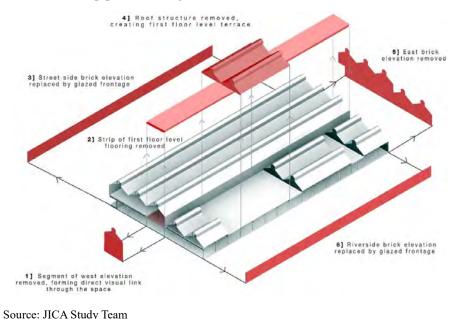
Exploded View of Waterfront Warehouse Indicating Adaptations to Enable New Uses
